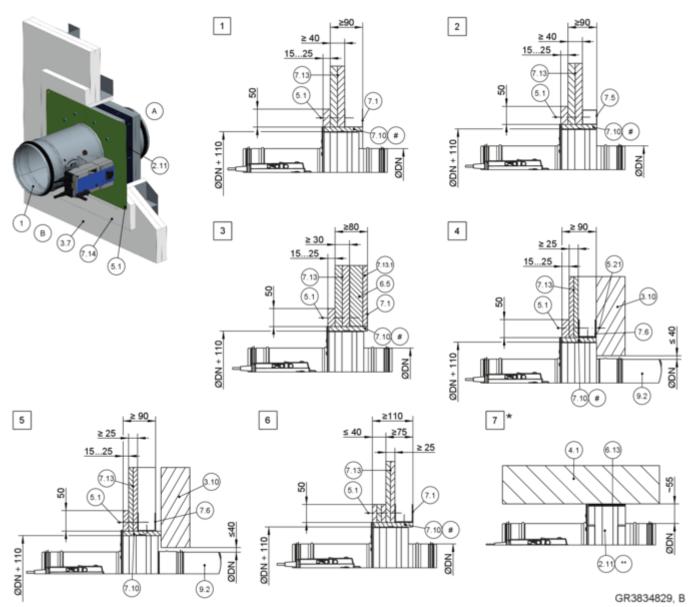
Dry mortarless installation into a shaft wall with metal support structure, with installation kit TQ2
